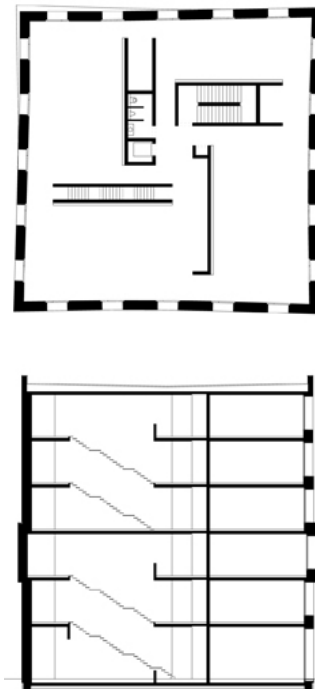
Floorplan and section of BE2226 (Source: architects Baumschlager-Eberle)
